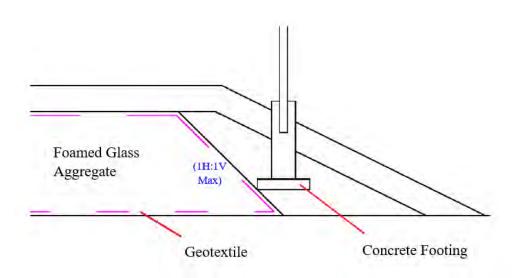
Typical Detail of Lighting Foundation where UL-FGA is used.
